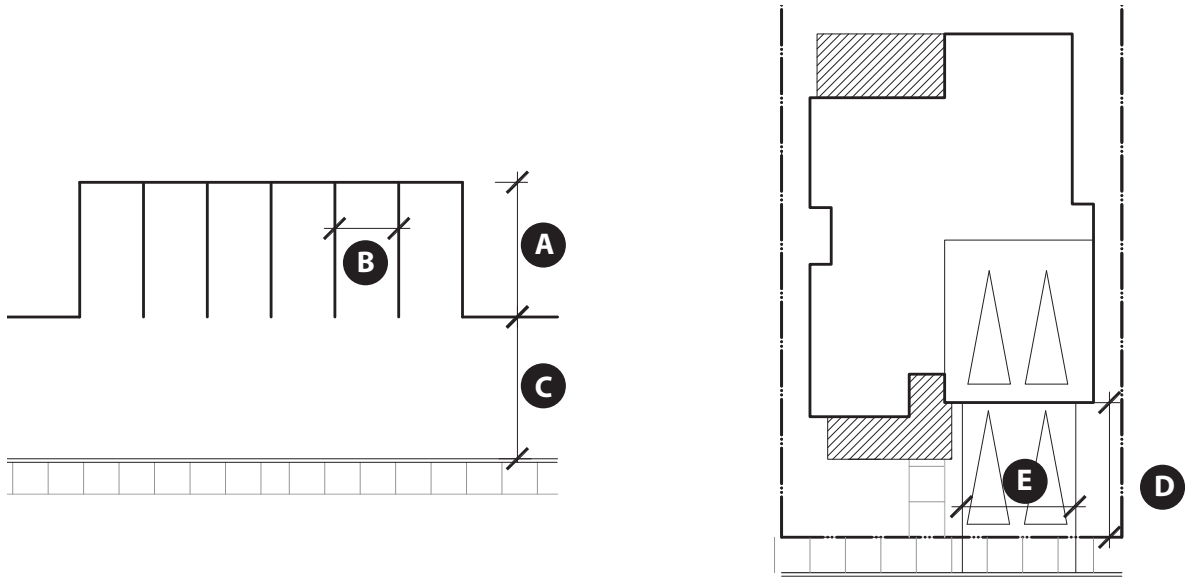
Parking and Loading Development Standards Diagrams: Residential
